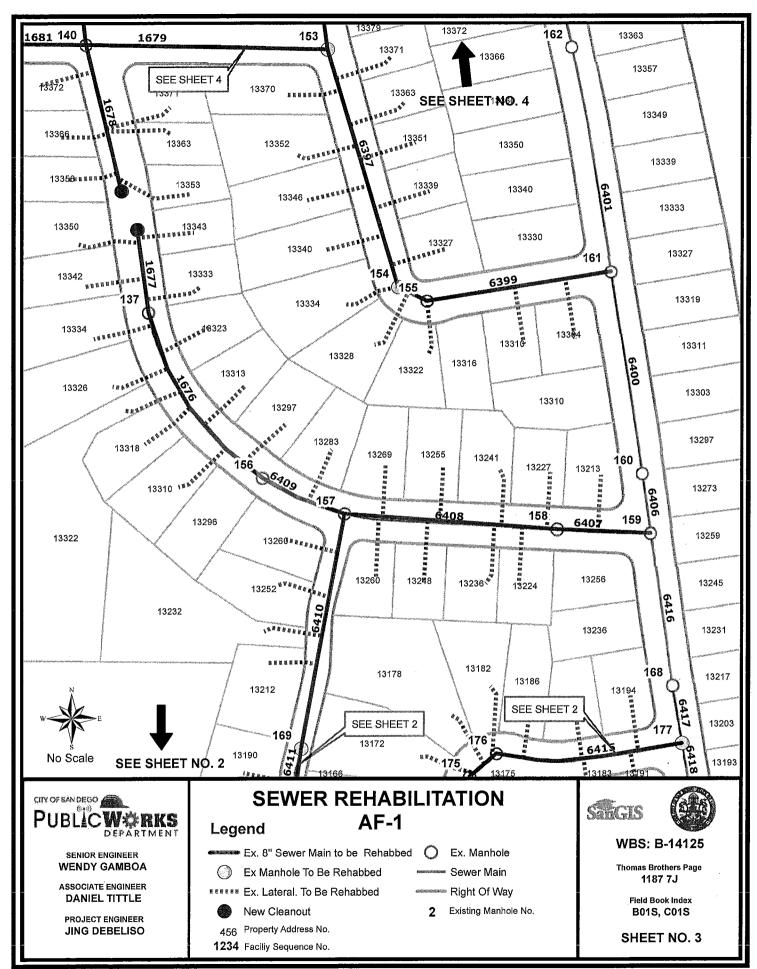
DETAIL MAPS, EASEMENTS, AND CONSTRUCTION NOTES
